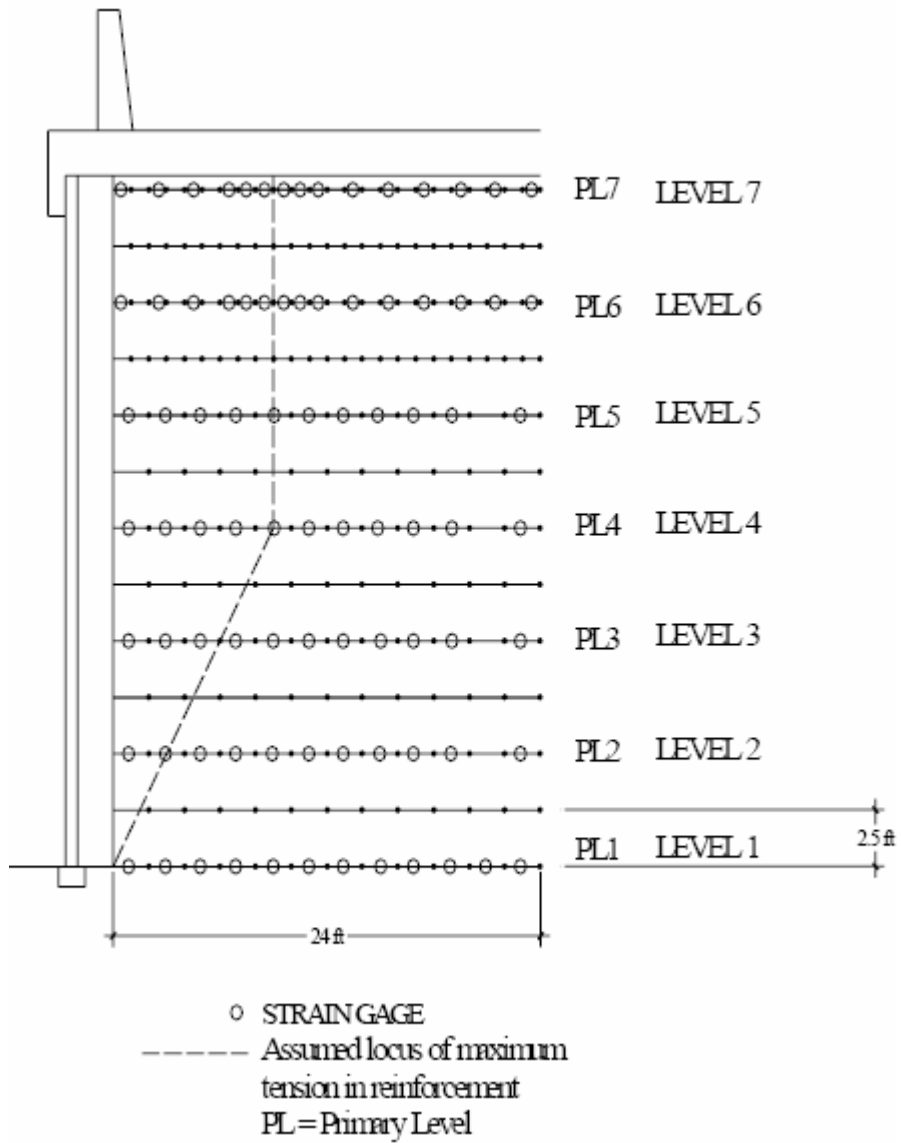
Elevation View of Wall Section with Instrumented Primary Reinforcement (Bay et al., 2003)
